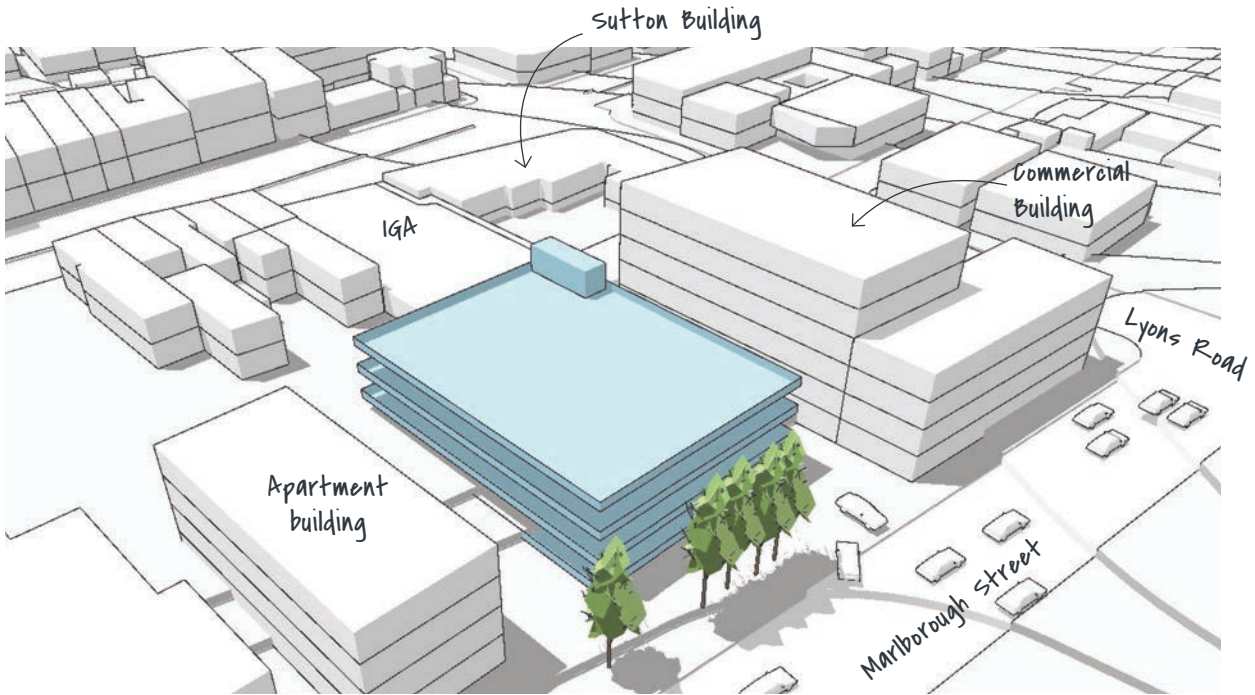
3D view of potential future multi-deck car park off Marlborough Street
